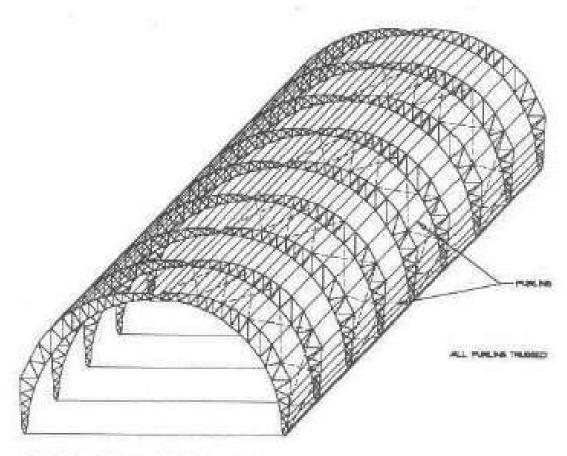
STEEL FRAME WITH THREE-HINGED ARCHES
